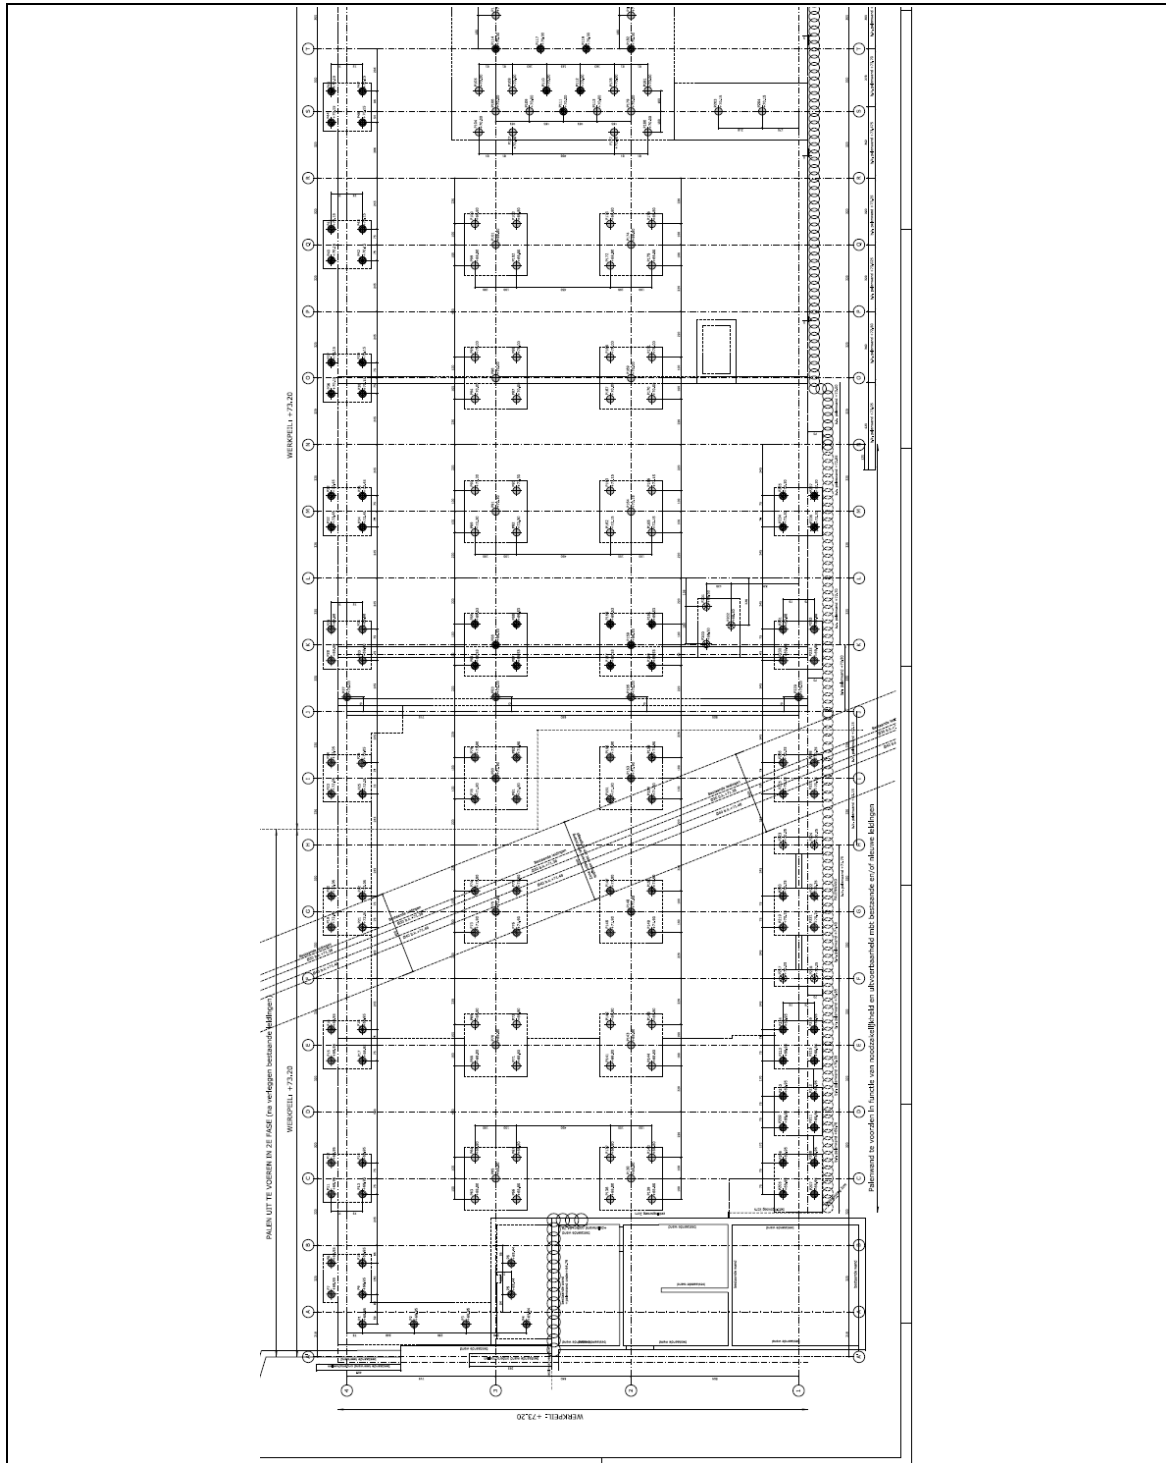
Schematic view of a part of the original foundation plan of the REGA-Instituut with the different pile groups supporting the pillars of the building frame and the connection tunnel
